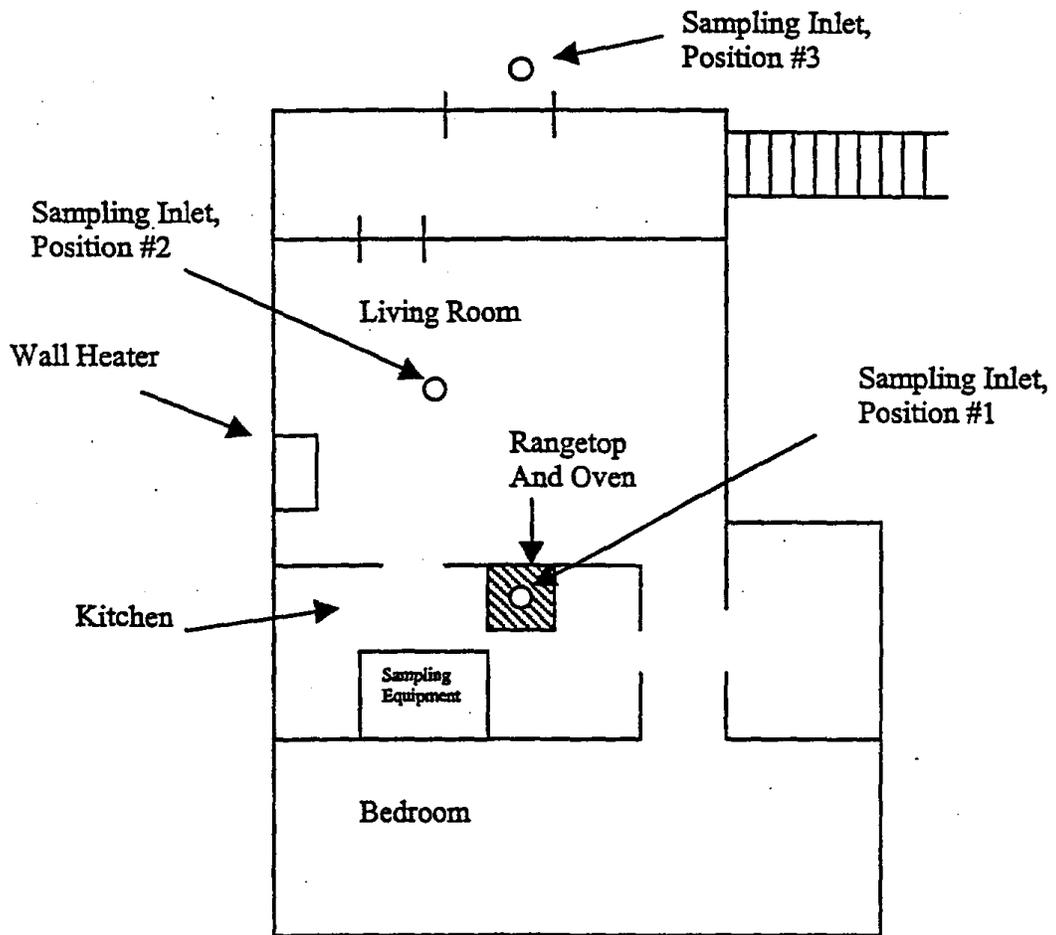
LAYOUT OF SECOND STORY APARTMENT USED AS SECOND SITE FOR FINAL FIELD TESTING
